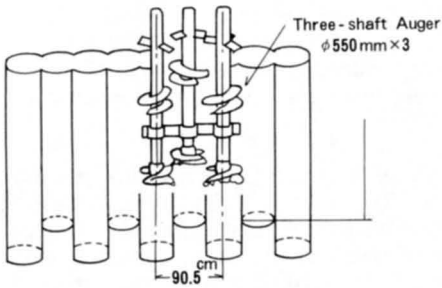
Illustrative description of forming the cutoff wall by in-situ churning method (Soil mixing wall method).
